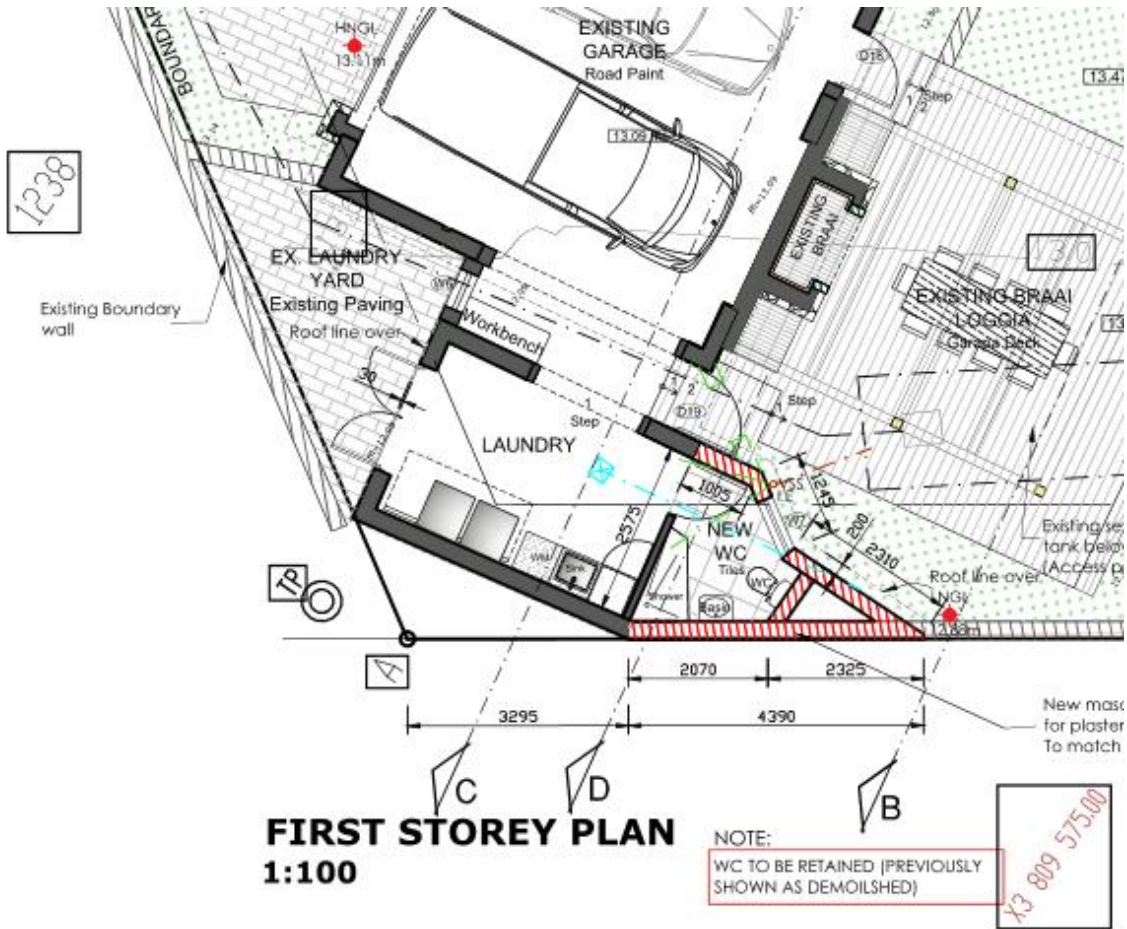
Proposed change of use of approved single garage to laundry room and as-built gardener's WC
